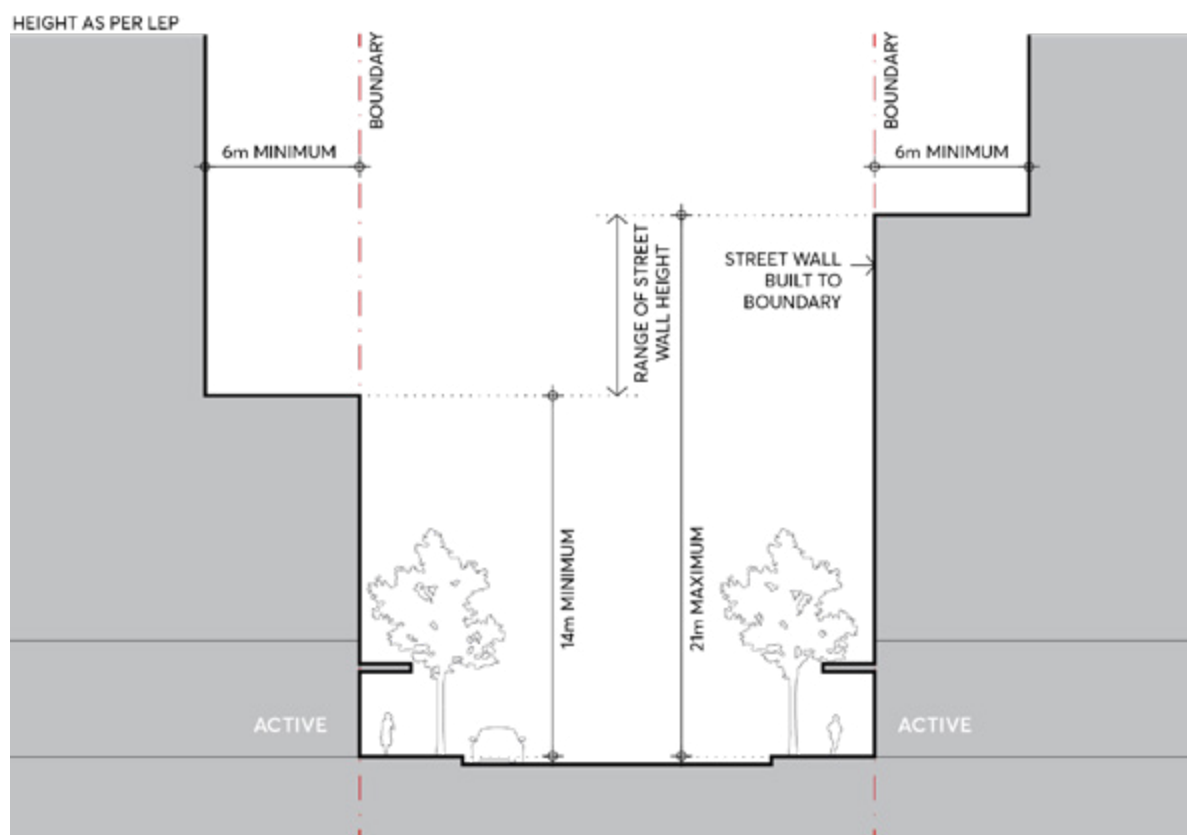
City East Block Phillip Street (Section B)
